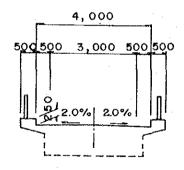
TYPICAL CROSS SECTIONS OF DOUBLE LANE ROAD
